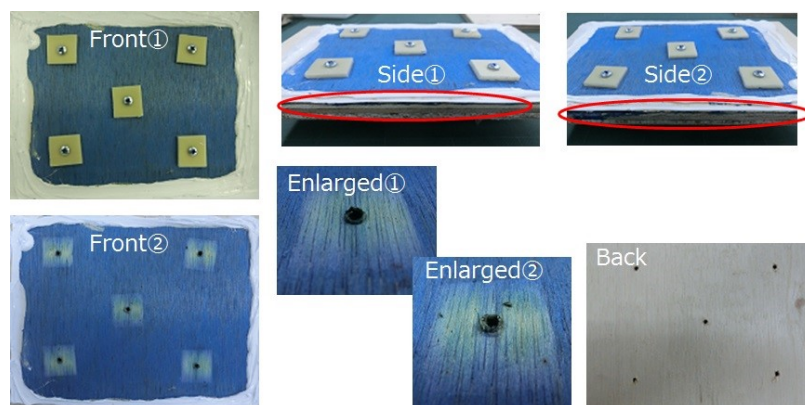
Appearance after AAMA screw water seal test when we placed no tape
